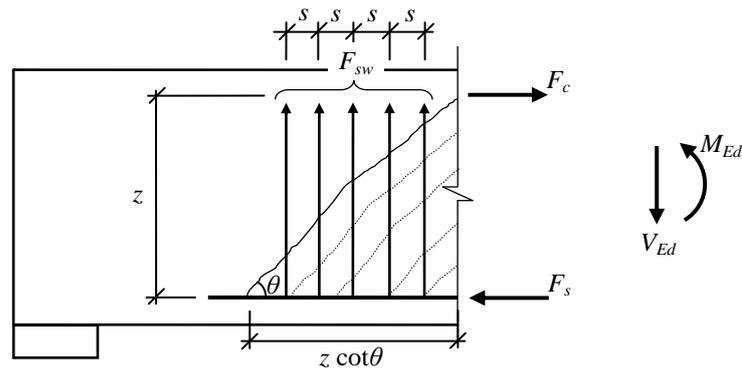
Truss model for derivation of the design value of shear force which can be lifted by vertical shear reinforcement.
